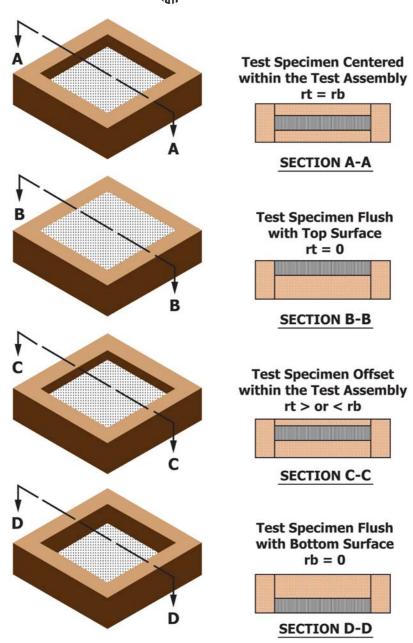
Horizontal Symmetrical and Asymmetrical Test Assemblies
